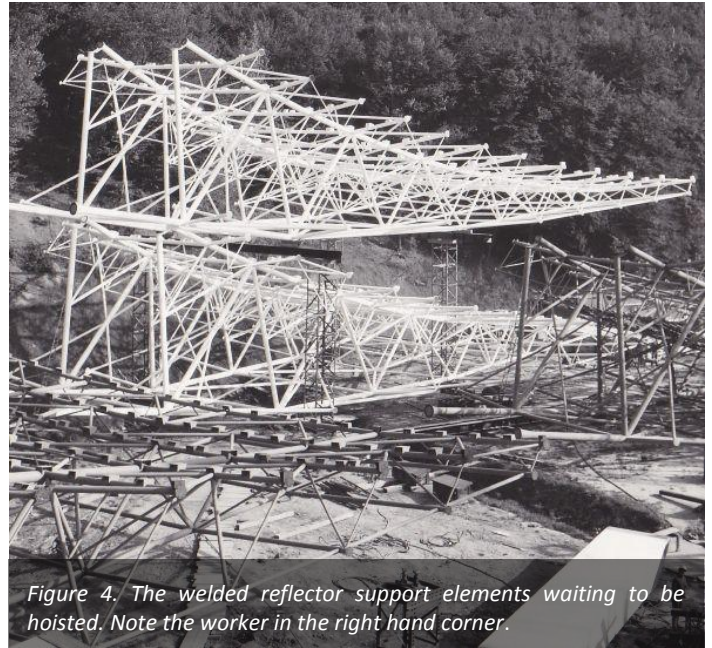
The welded reflector support elements waiting to be hoisted. Note the worker in the right hand corner.
